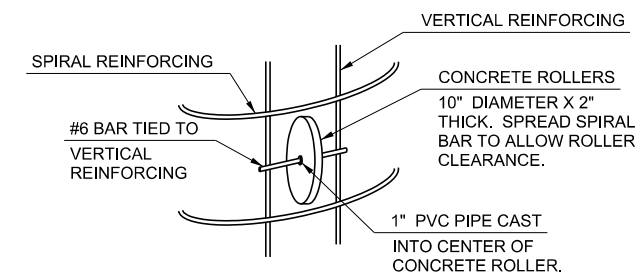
DETAIL OF ROLLER PLACEMENT IN DRILLED SHAFT
